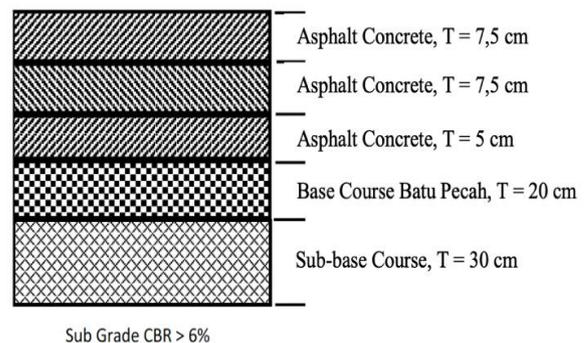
Layer Details of Existing Runway Pavement Segment 1
